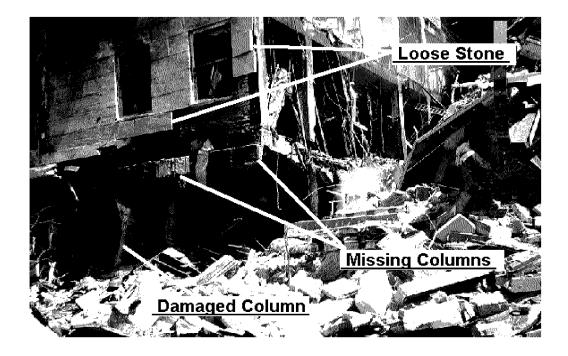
Missing Columns. The corner of the structure adjacent to the collapse was missing two columns and one was severely damaged. The section cantilevered approximately 80 feet.
